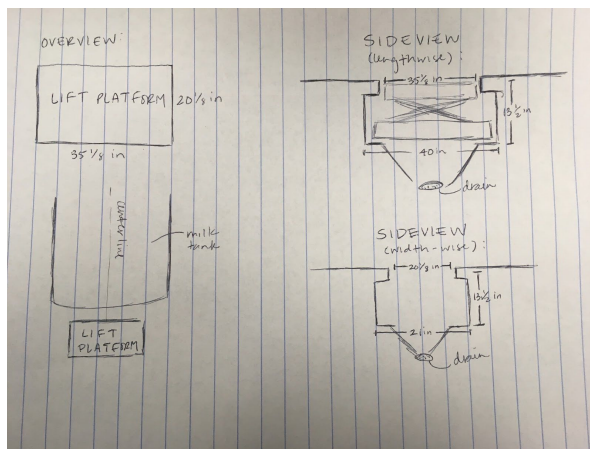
Dimensions and design for implementing lift into ground with drainage.
